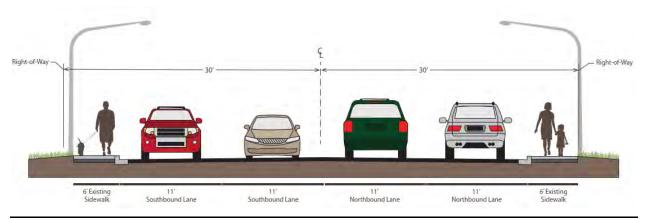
Proposed Typical Section – Burwell Street to 13th Street
